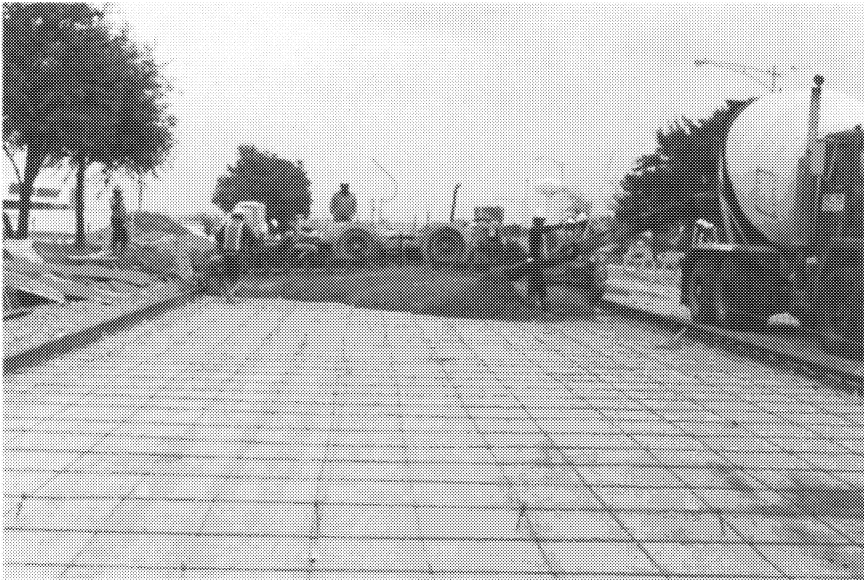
A lightly loaded, lightly reinforced slab on ground.
